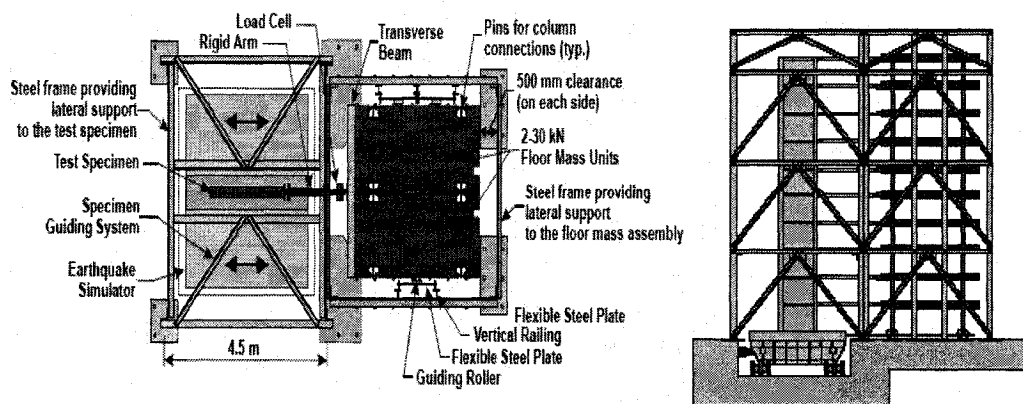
2: Suggested test set-up: a) plan view; b) elevation view.
